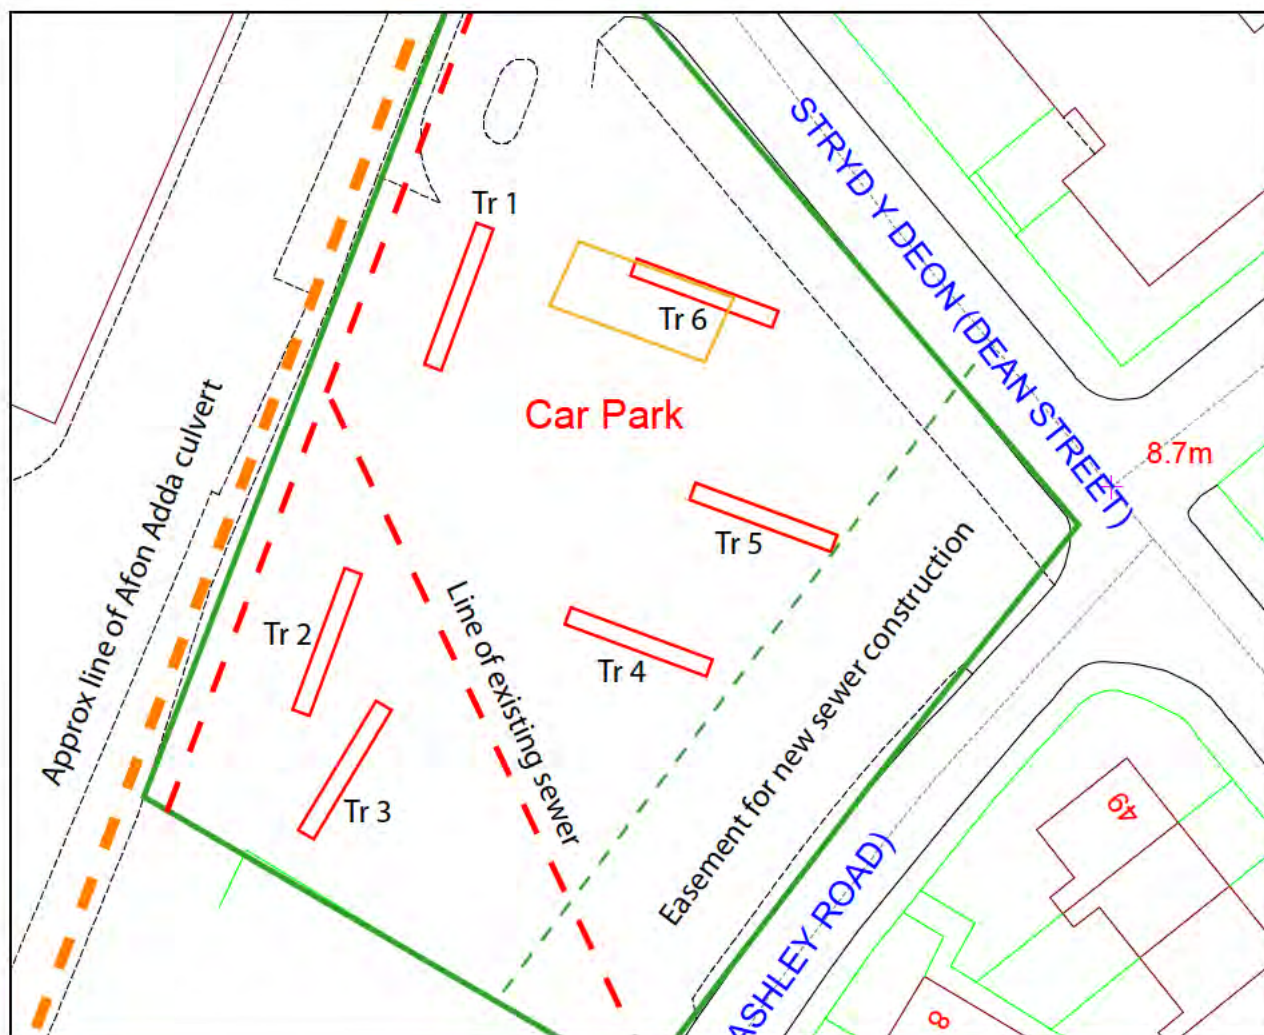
Dean Street Car Park Excavation, Bangor. Scale 1:500. Green: outline of proposed development area. Yellow: Excavation Area. Red: Excavated archaeological evaluation trenches.
